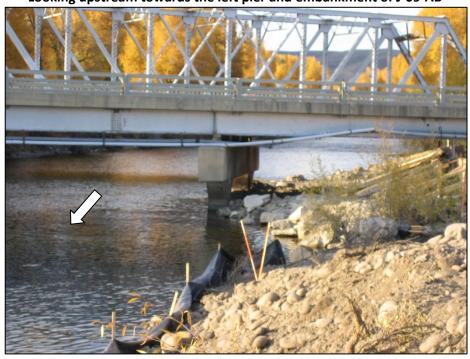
Looking upstream towards the left pier and embankment of J-09-AB
